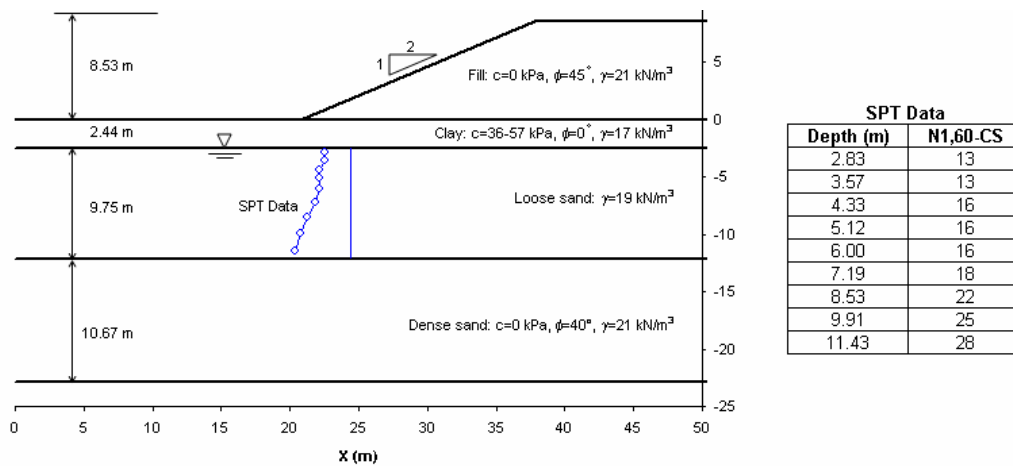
Right abutment – soil profile and dimensions (not to scale)
